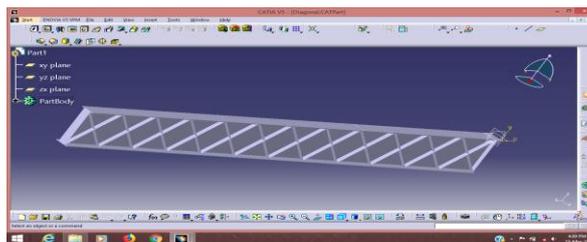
Geometry of the plate girder with diagonal stiffener arrangement
